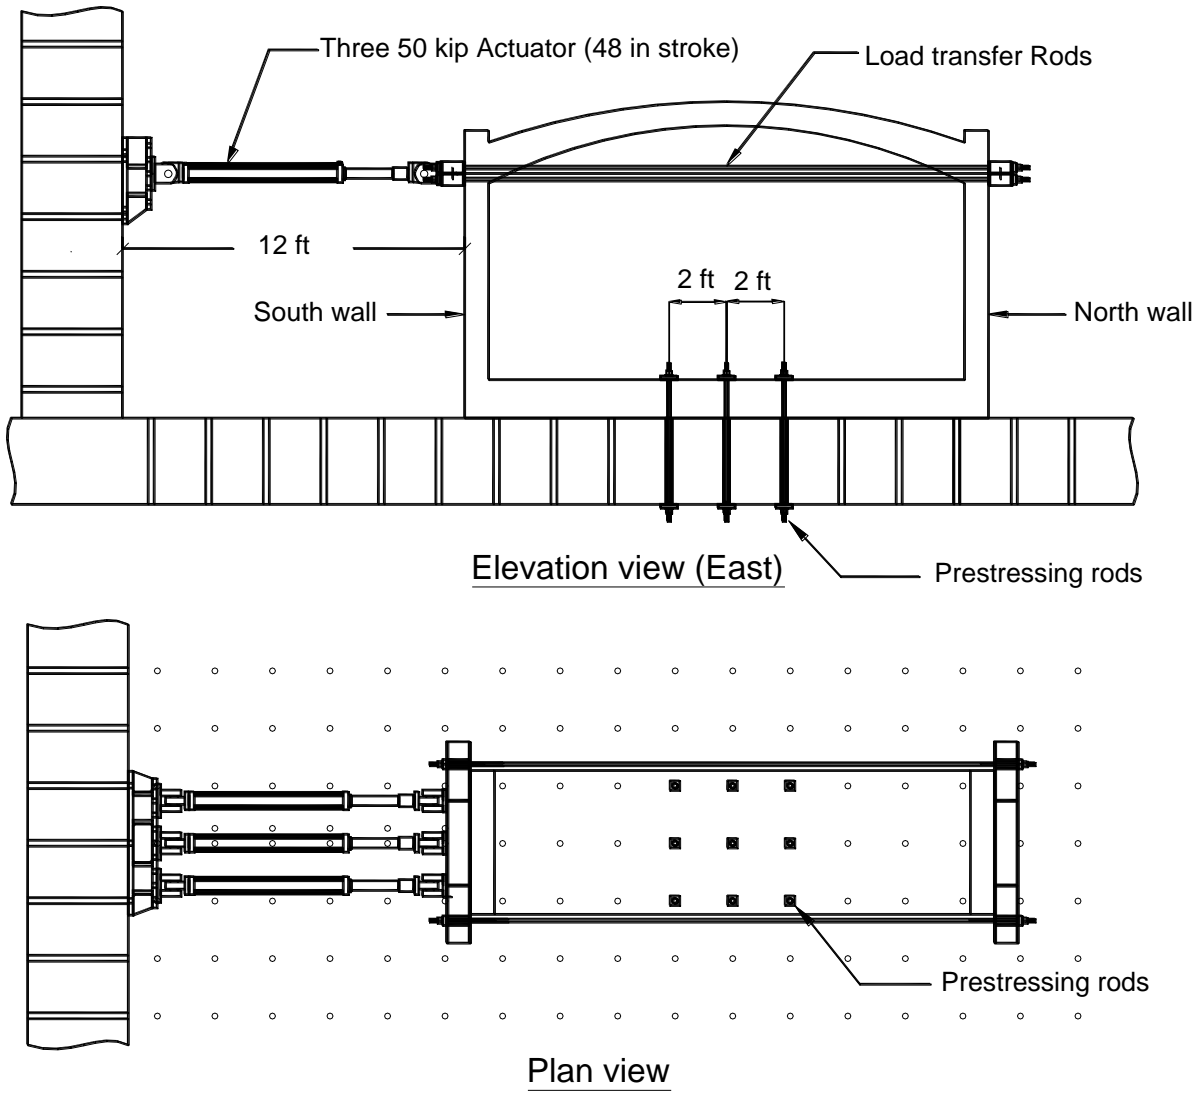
Elevation and plan view of test setup in the South Powell Lab
